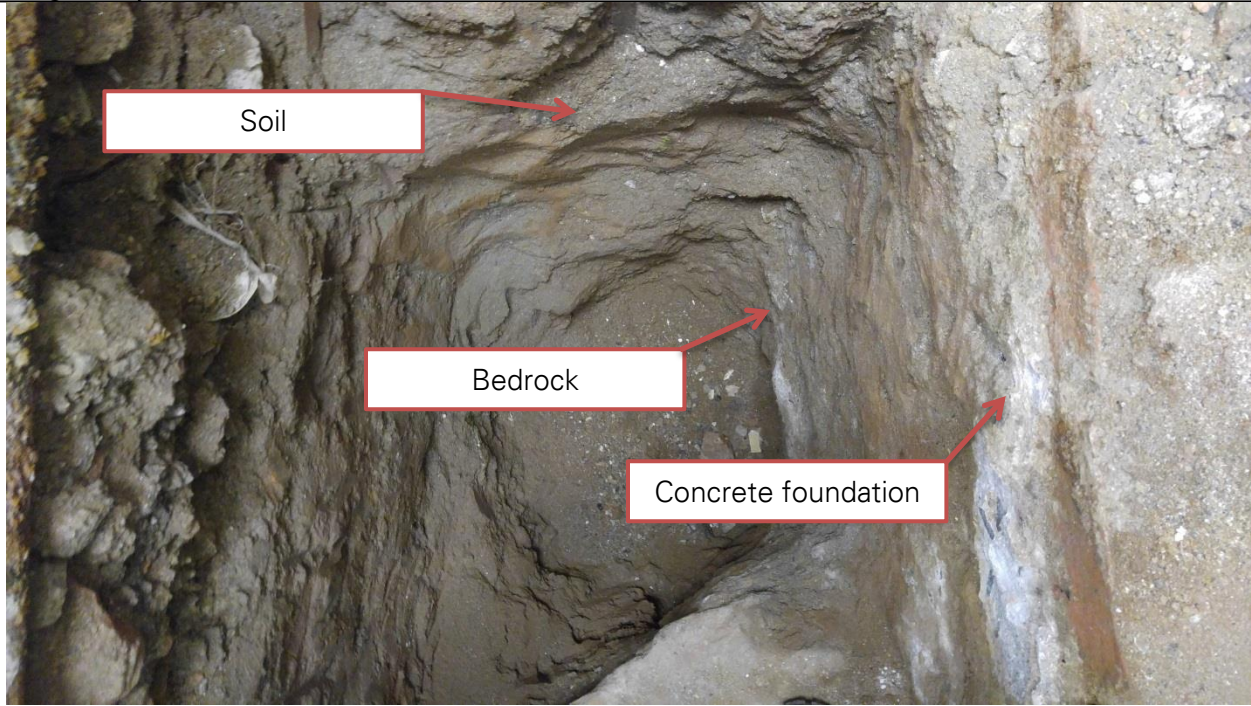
Test Pit TP-2: The concrete footing observed bearing on bedrock (facing east)
